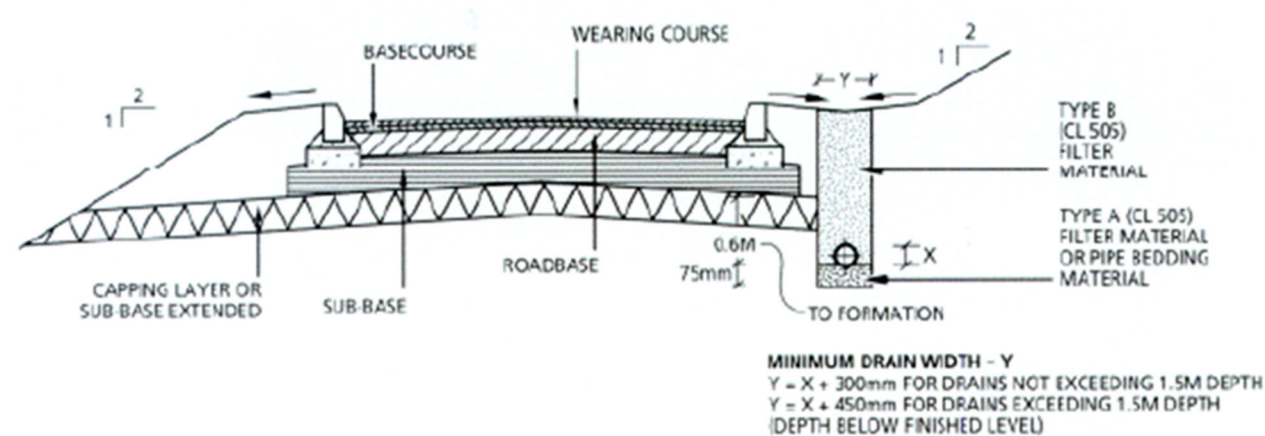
Section Through Road Indicating Sub Grade Drainage
